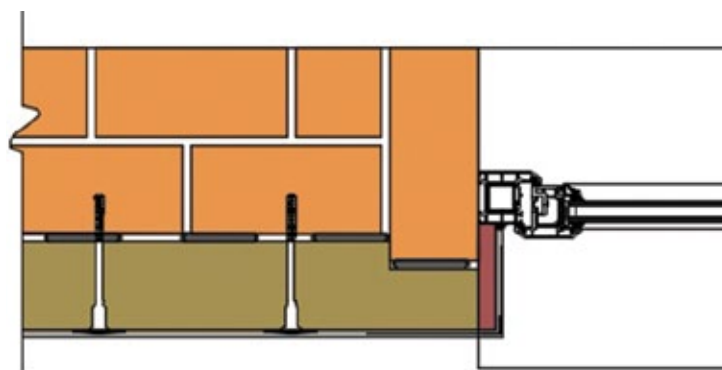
Reveal detail when existing window frame is flush with the existing wall face
